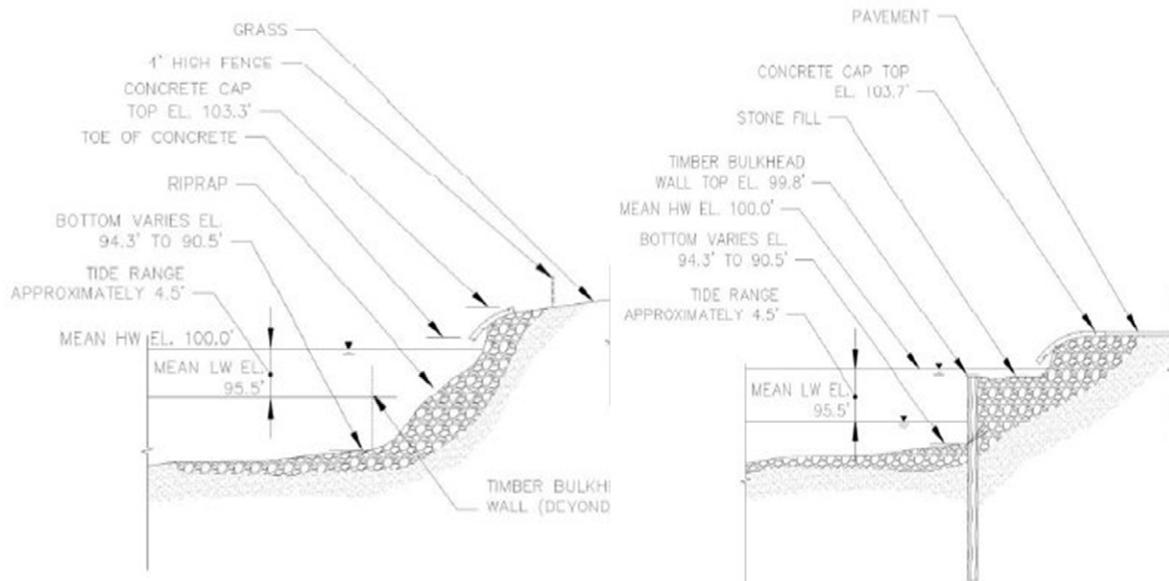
Cross Section Views of Existing Conditions of Shoreline³
